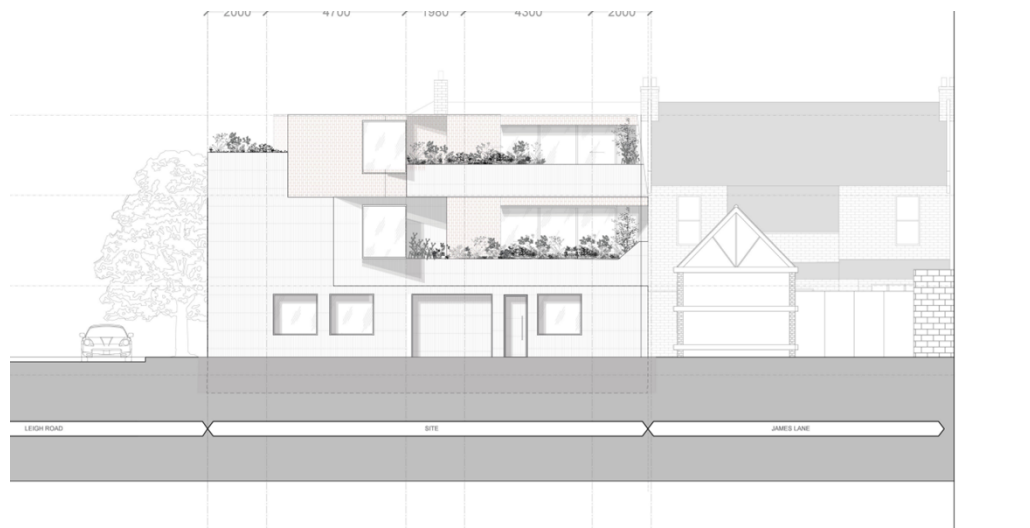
Flatted development under pre-application reference: 183600 which was considered unacceptable.
